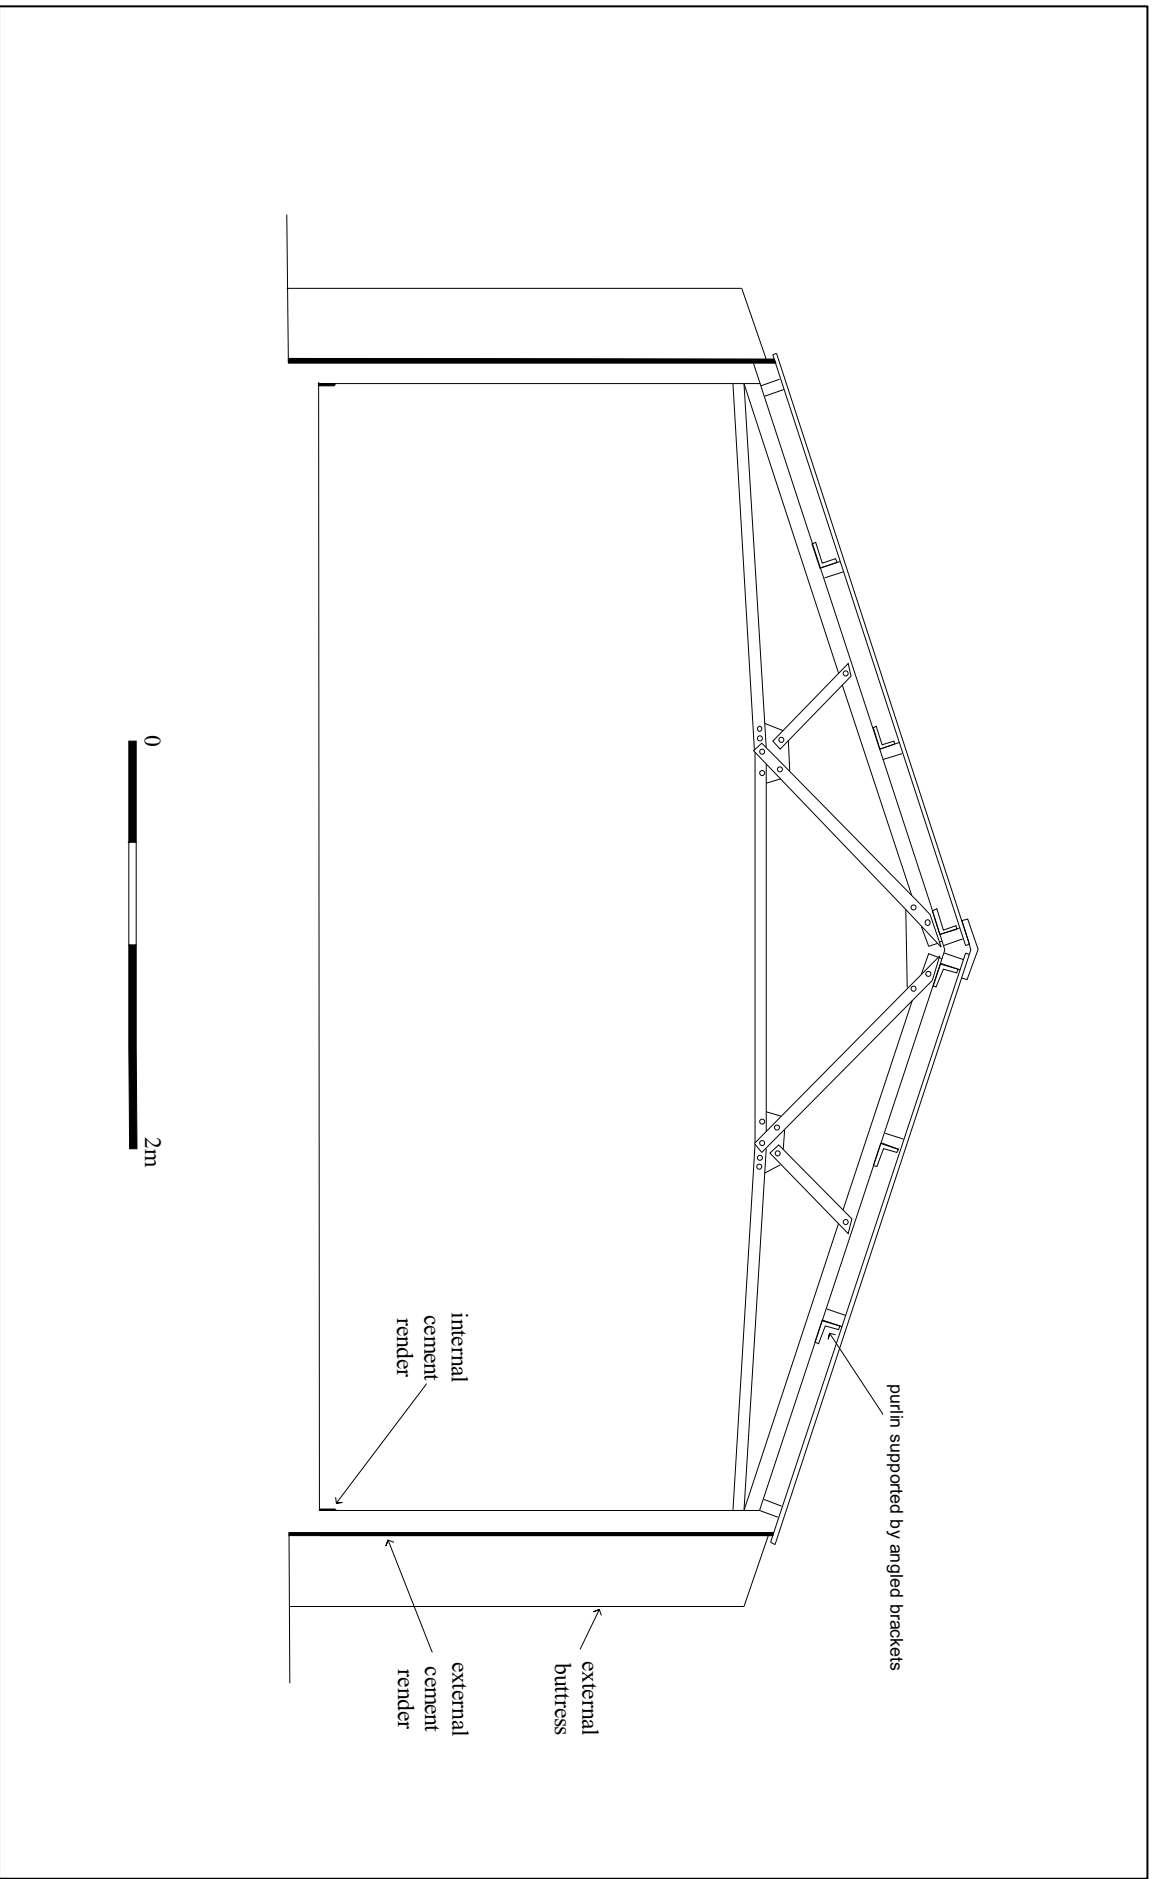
Building 1 and 2 - typical section showing roof truss arrangement
